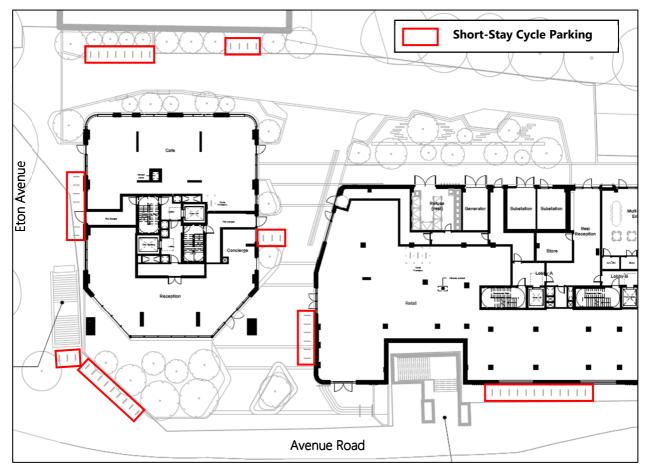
Site Plan showing Short-stay Cycle Parking
